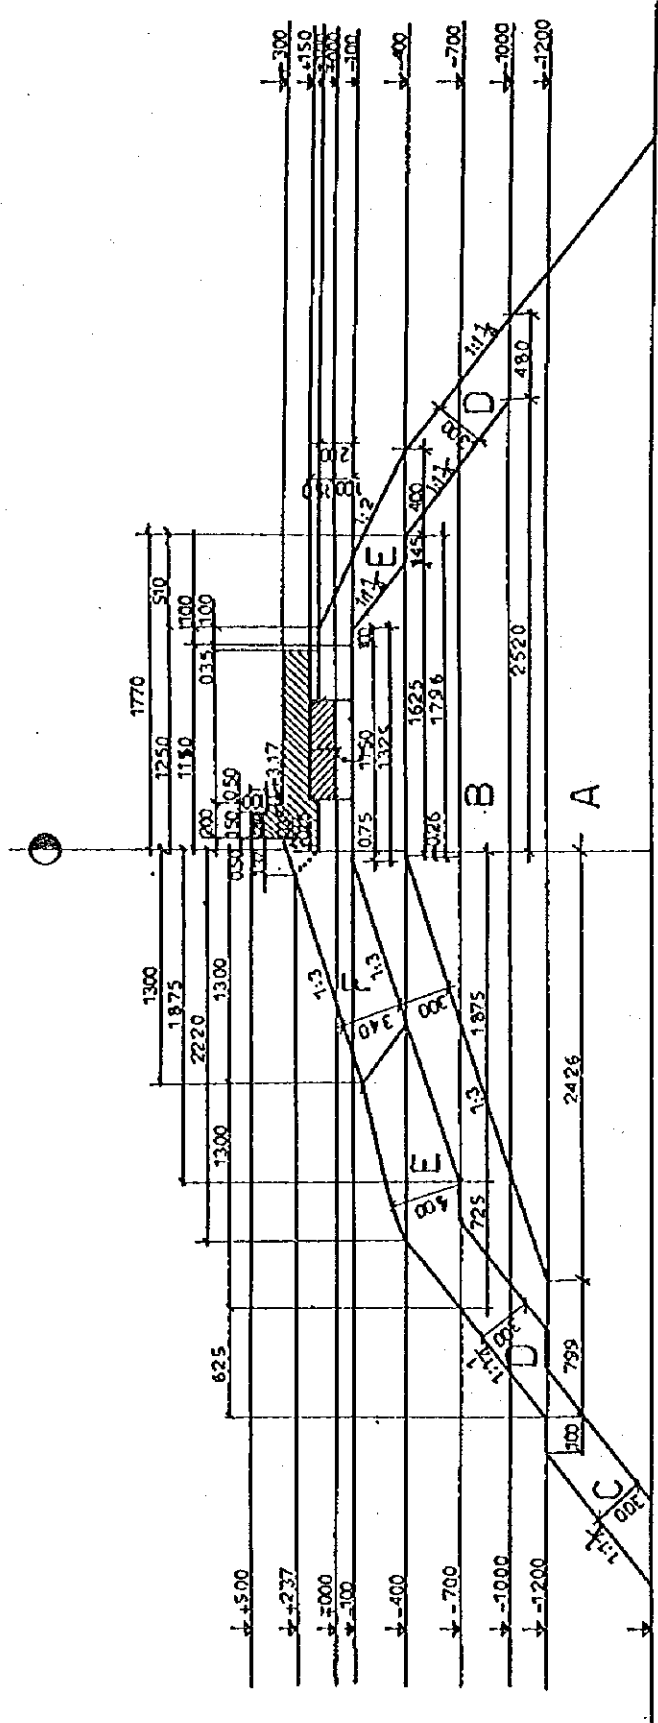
Typical Cross Section of Breakwater in Old Port Area-Latakia Port
